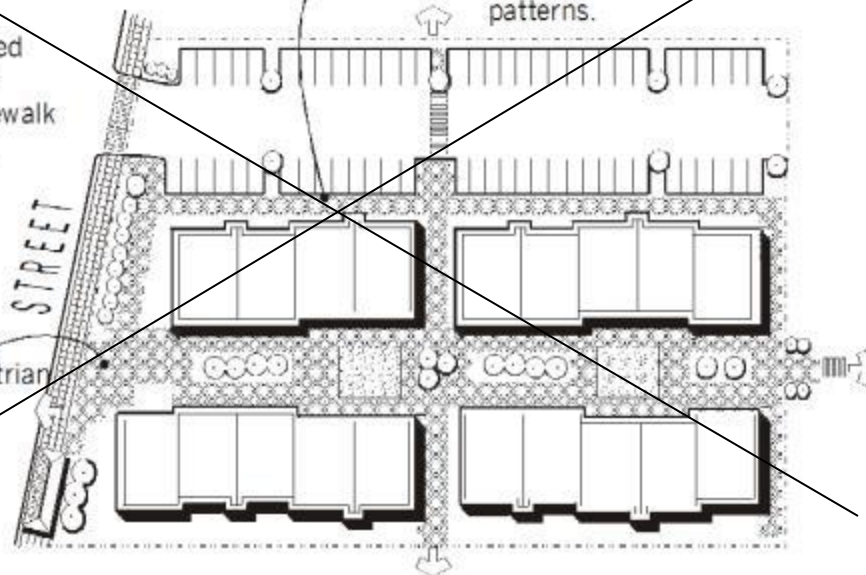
(D): Avoid parking that dominates the site. Encourage parking located behind or on the side of buildings and common open space between buildings.
